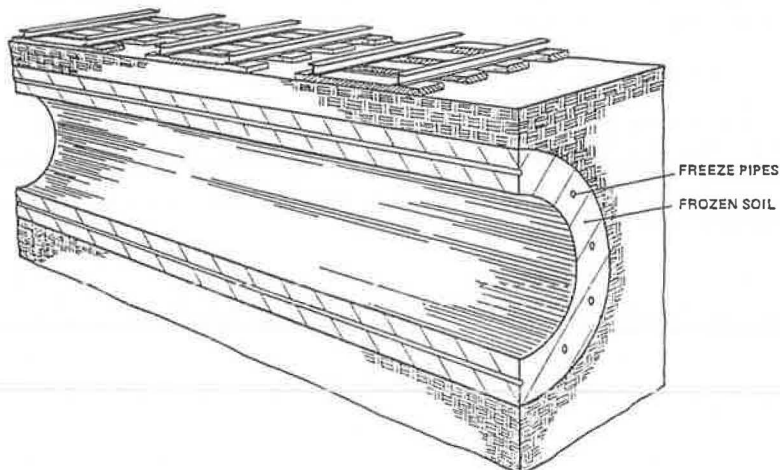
Frozen-soil tunnel using horizontal freeze pipes.
